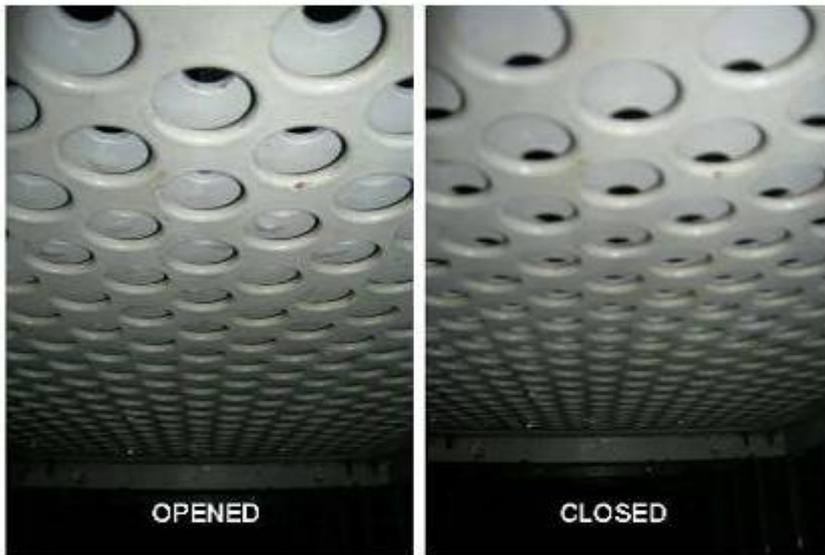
Typical Floor Screen Baffle – Perspective 2
